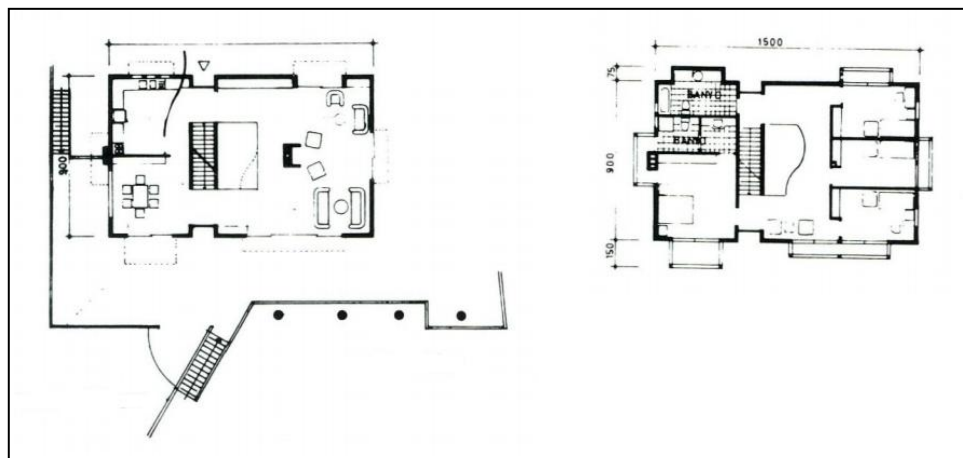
Floor plans of Bayramoğlu houses type 3 (Gorbon and Dinçer, 1989) [93]
